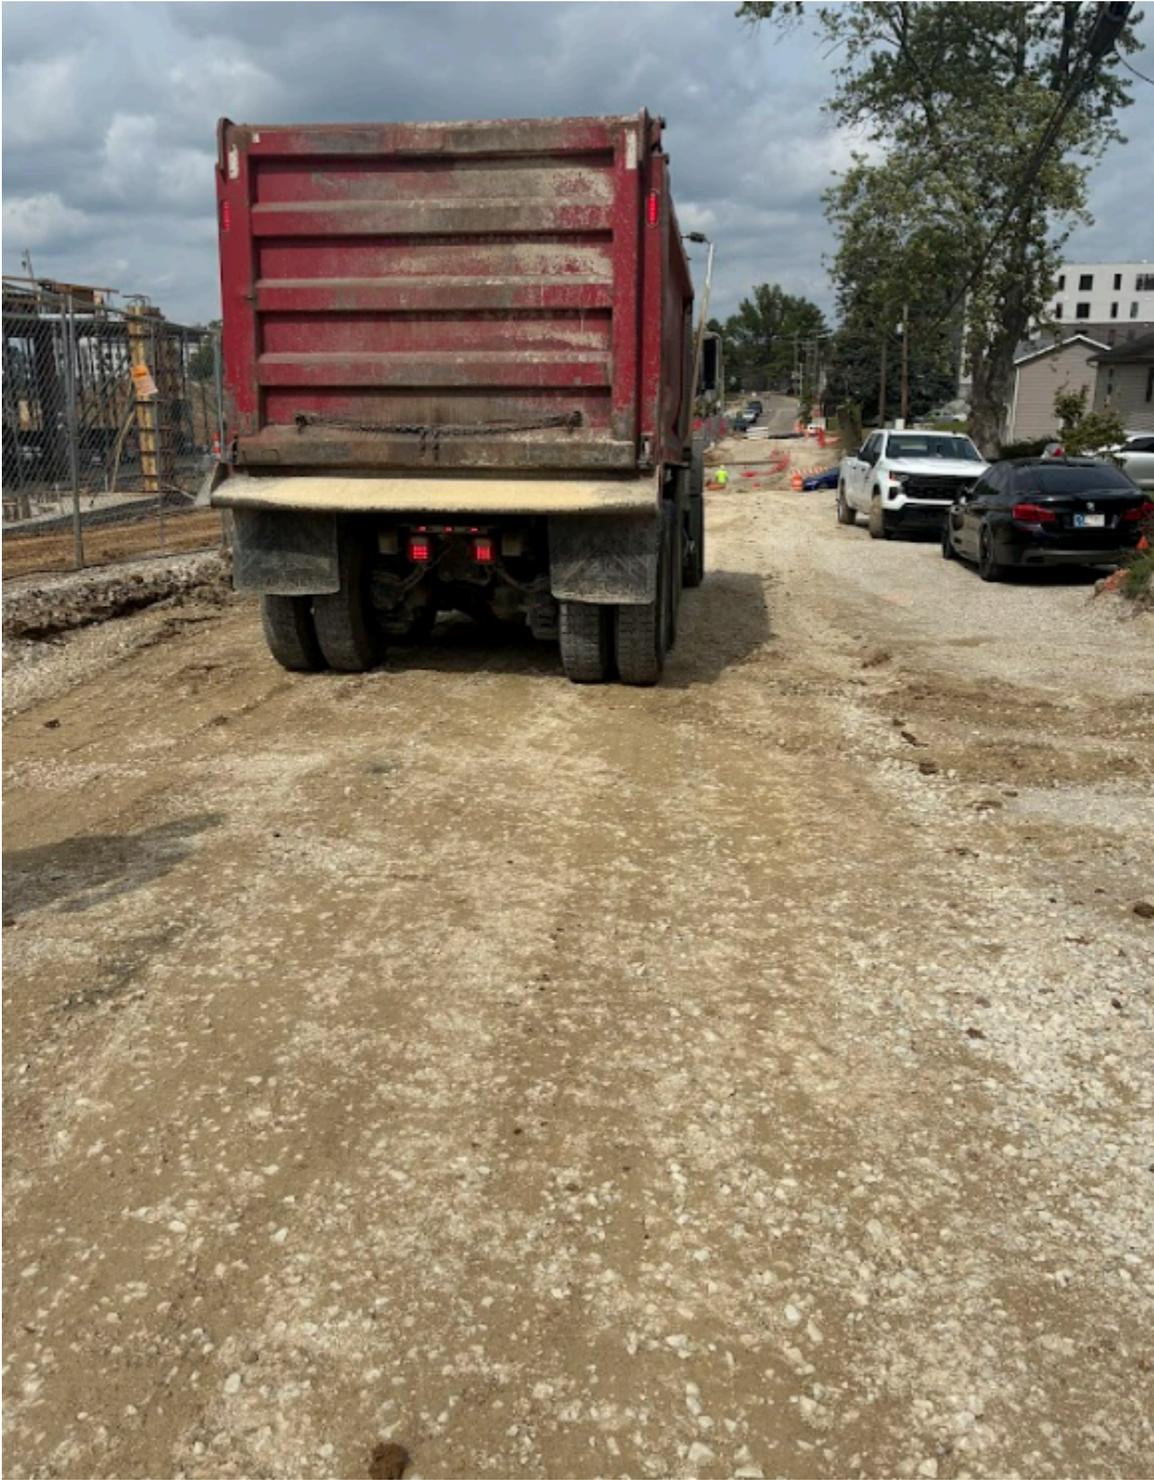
Northbound view of N Lincoln St taken on September 24th, 2025 showing proof roll being performed prior to base layer paving
